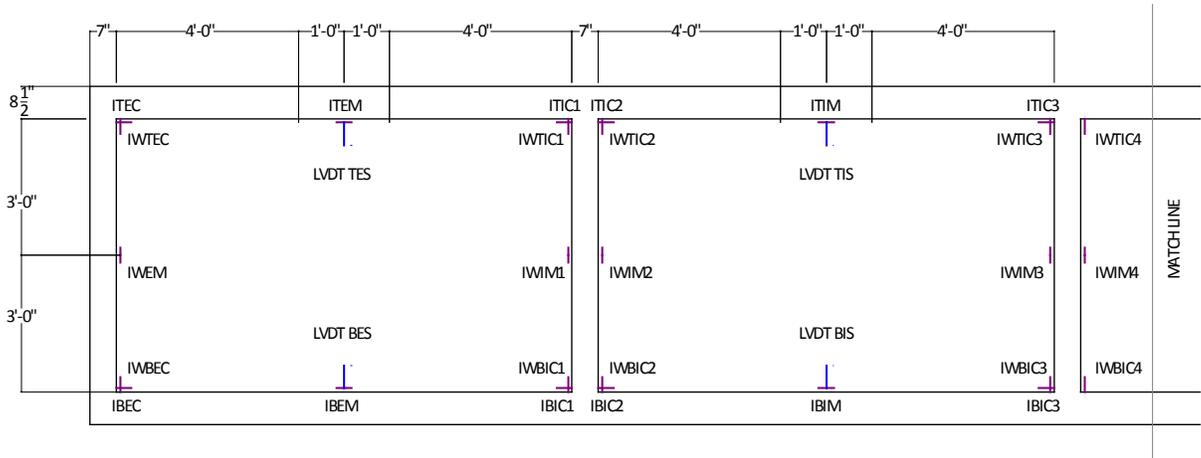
PLAINVIEW INSTRUMENTATION PLAN.
